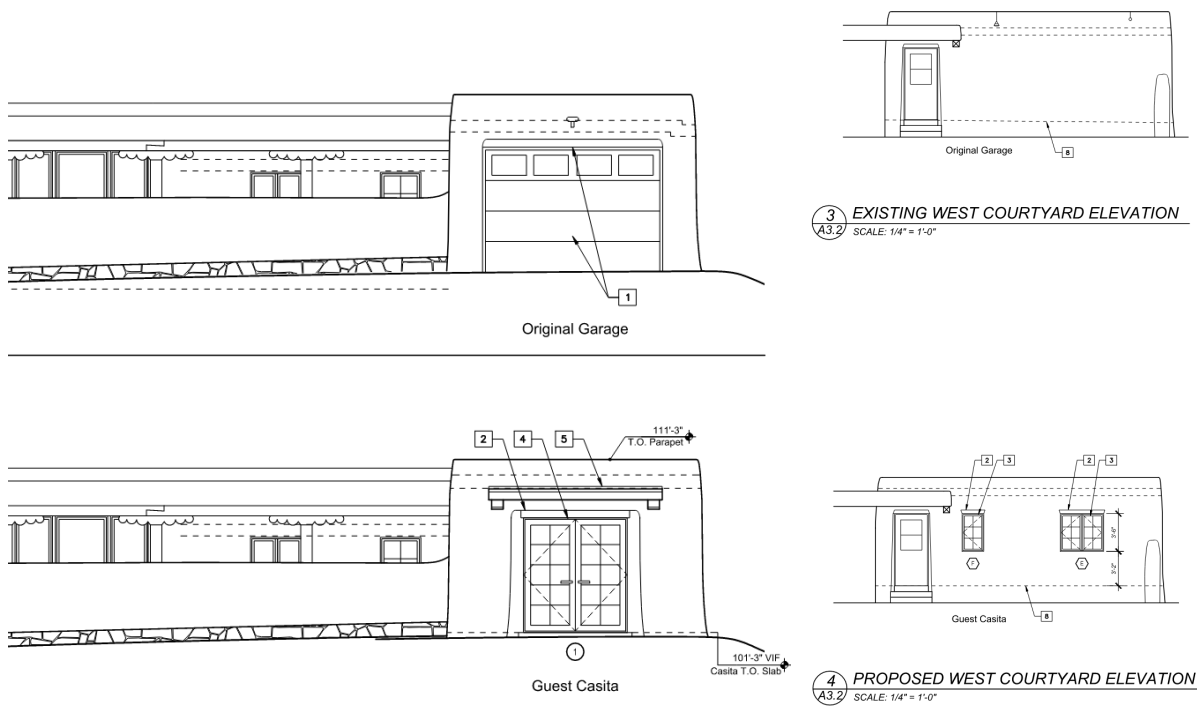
Existing and proposed south and west elevations. See Attachment C-2 for full plans.
